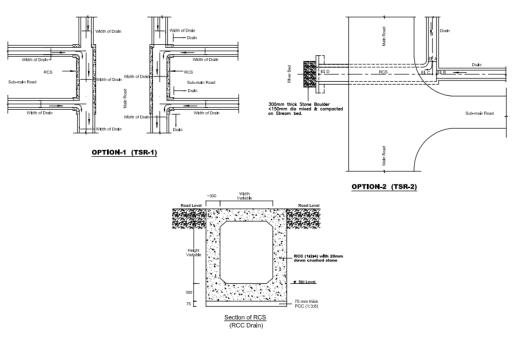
Typical section of Road Crossing Structure (option-1 & 2)
